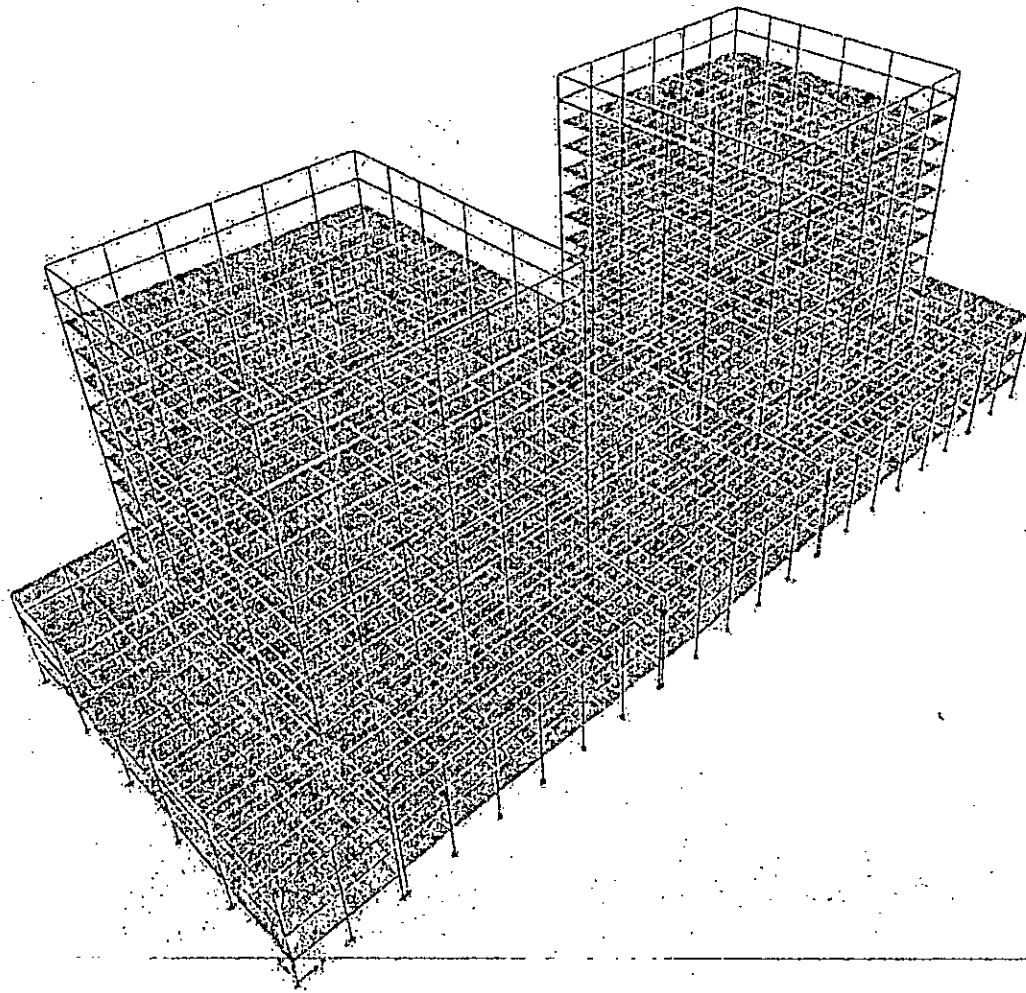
3D Wire Frame Model of the Tower A and Tower B
